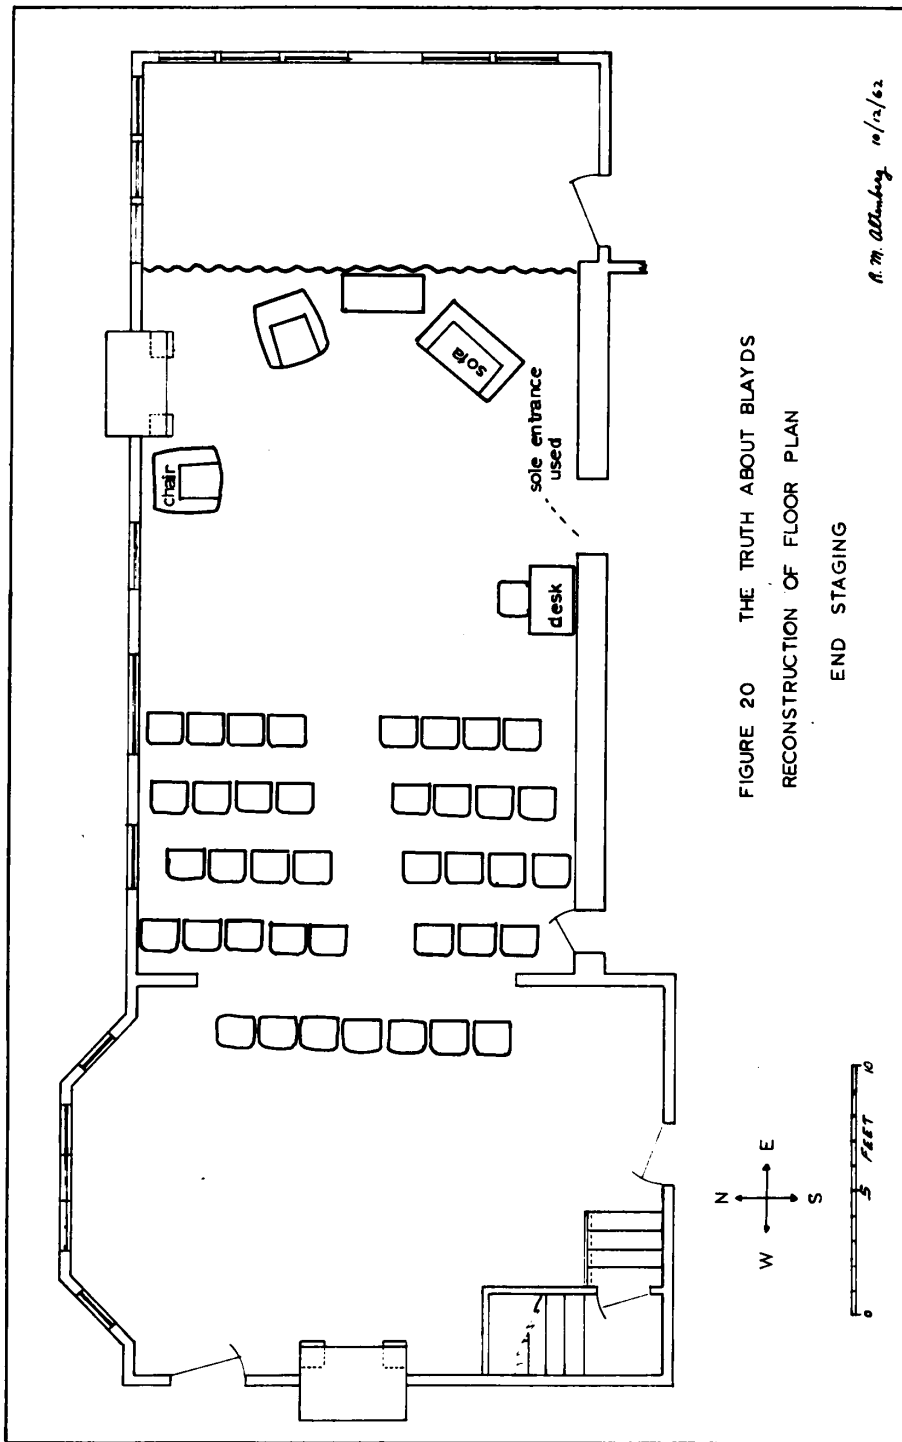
Reconstruction of end staging floor plan, *The Truth About the Blayds*.
